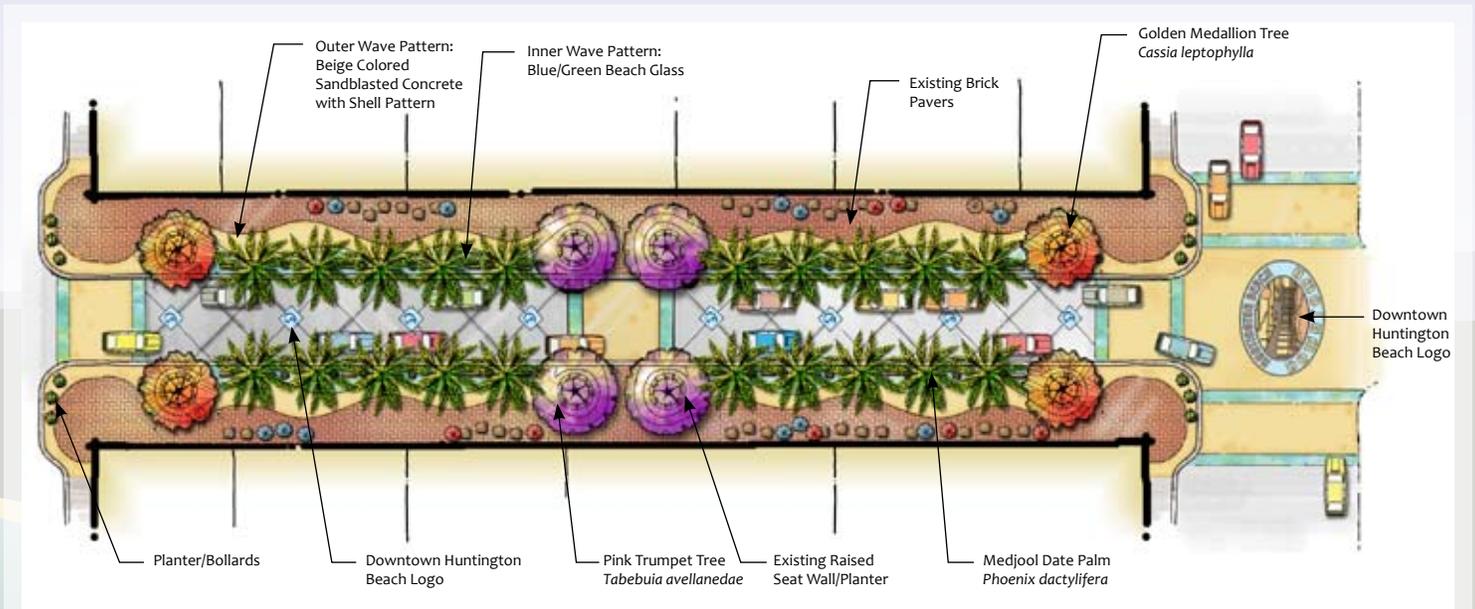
Plan view with trees of Streetscape 1 - Main Street between Walnut Avenue and Orange Avenue
